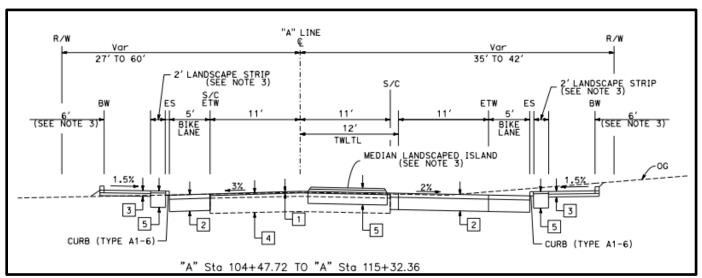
Project Report Cross Section at Surf Market (landscape version).
